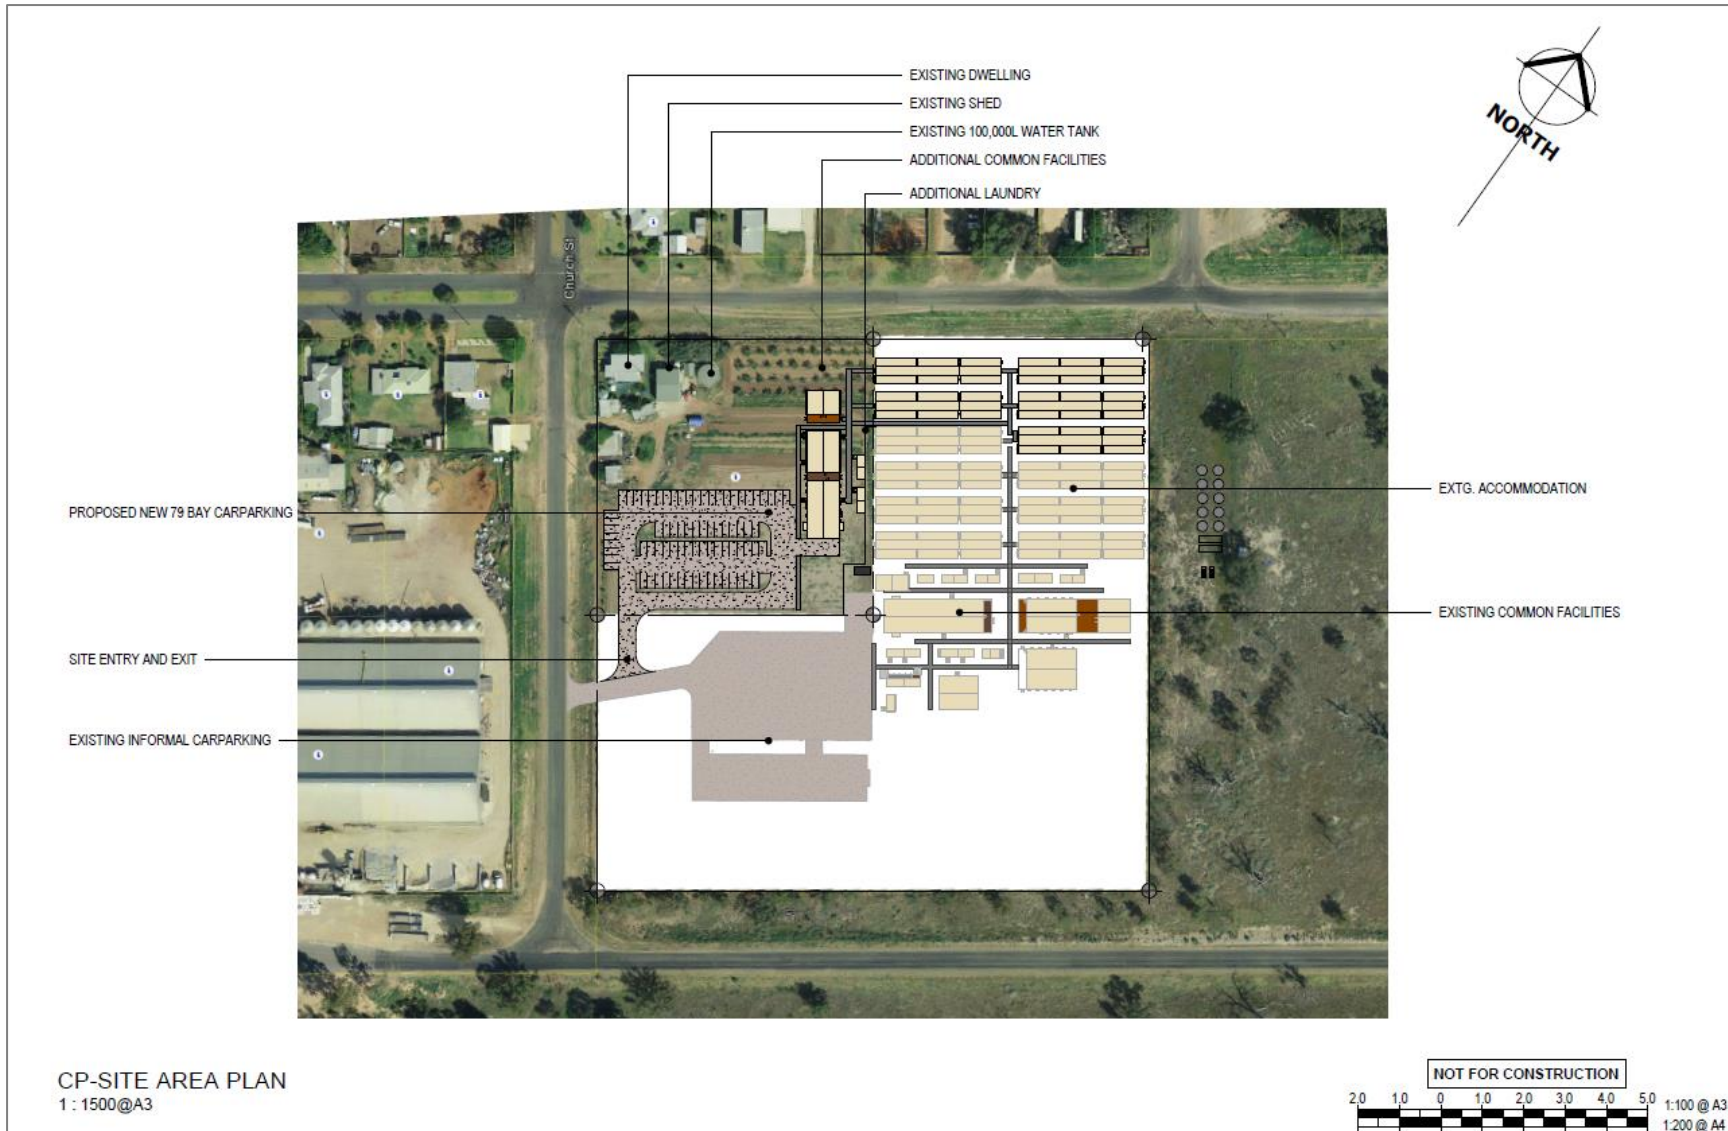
Iluka temporary off-site construction camp – conceptual plan
